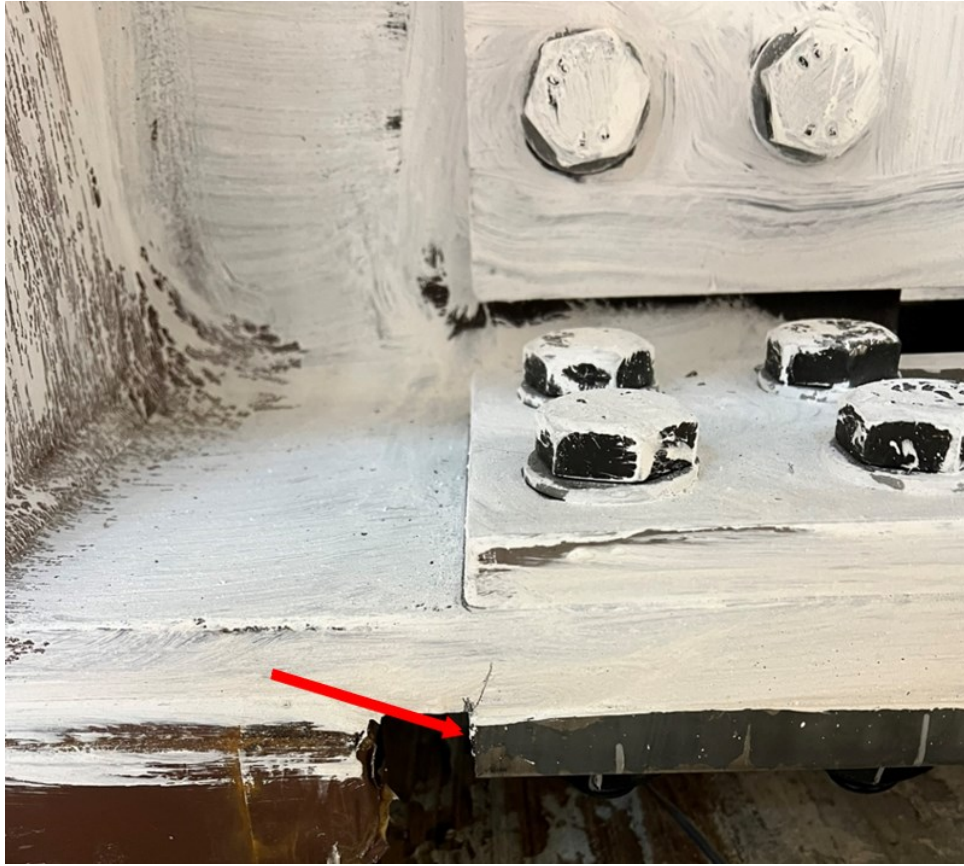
Concept A Bottom Flange Splice Plate Markings Pre-slip.
